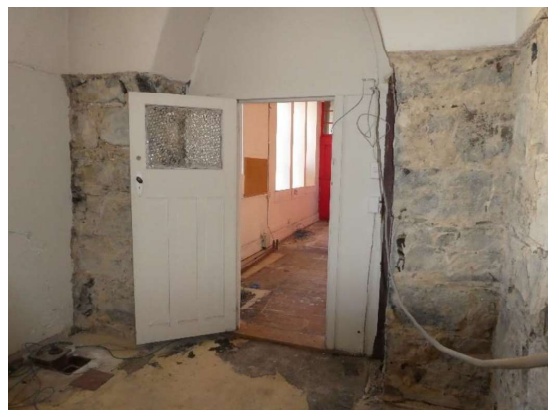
Showing the defective plaster to the basement walls within the marketing office.
